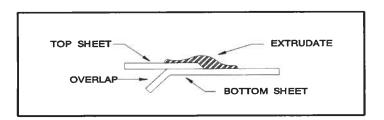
Fillet-Extruded Geomembrane Weld
